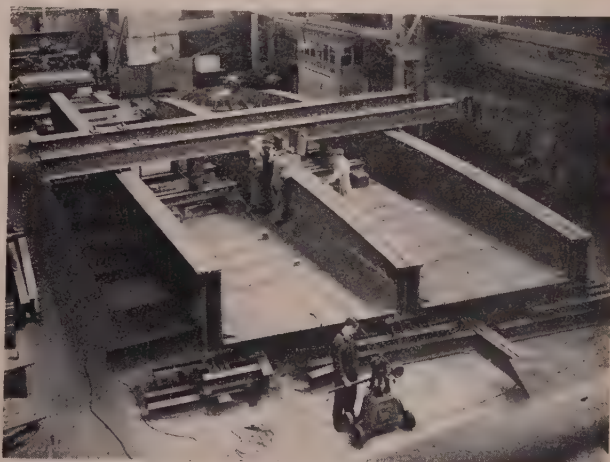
Stewarts Road Bridge. Testing cross-girder connections
